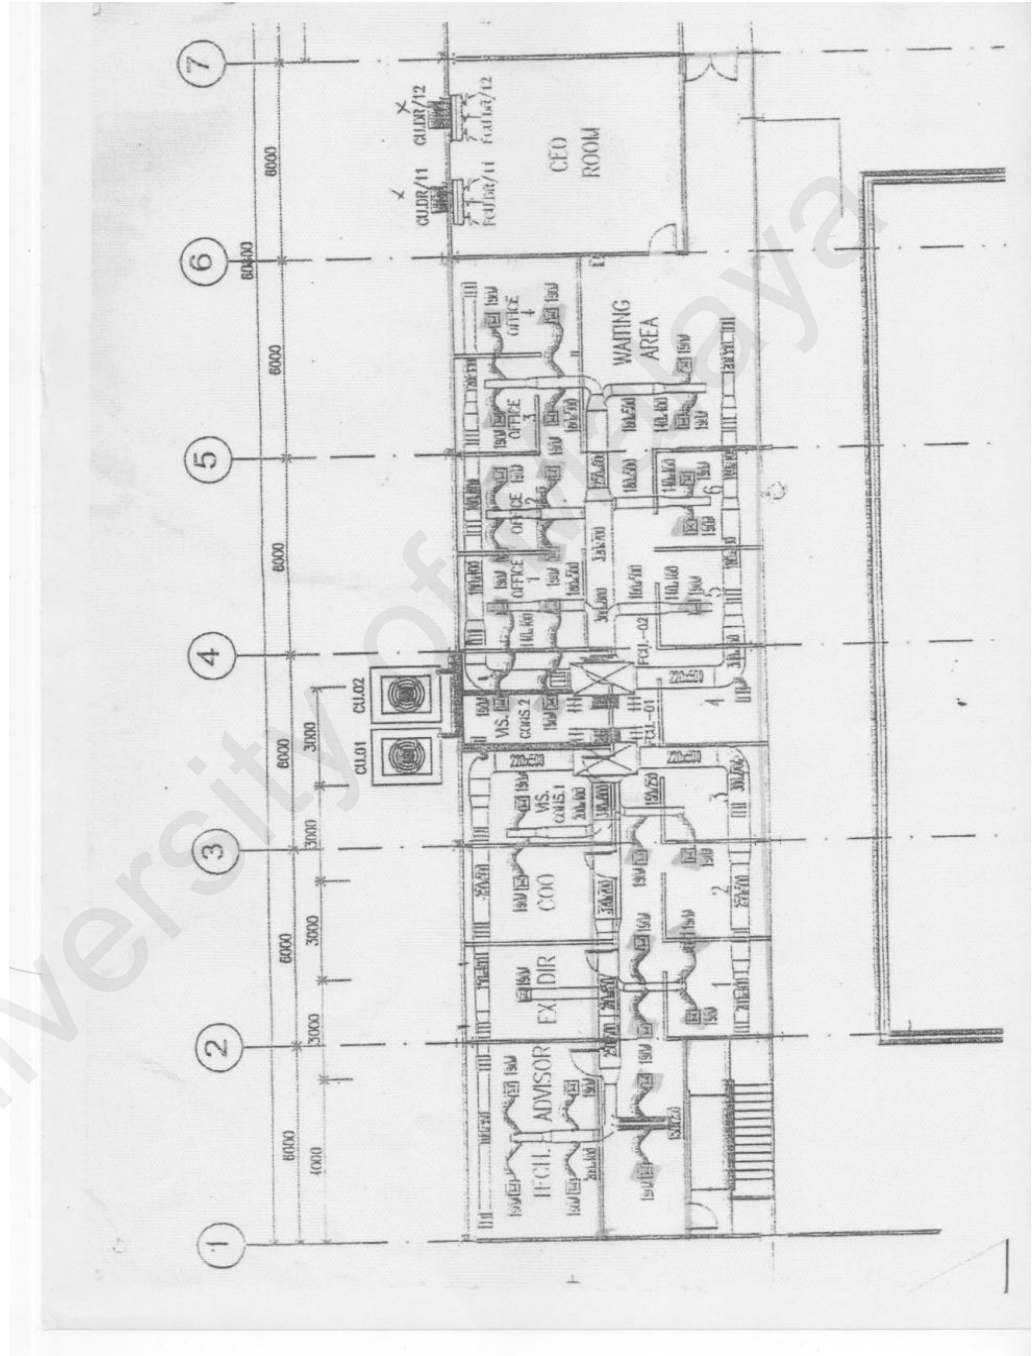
Mechanical and Electrical Drawing of CREAM building
